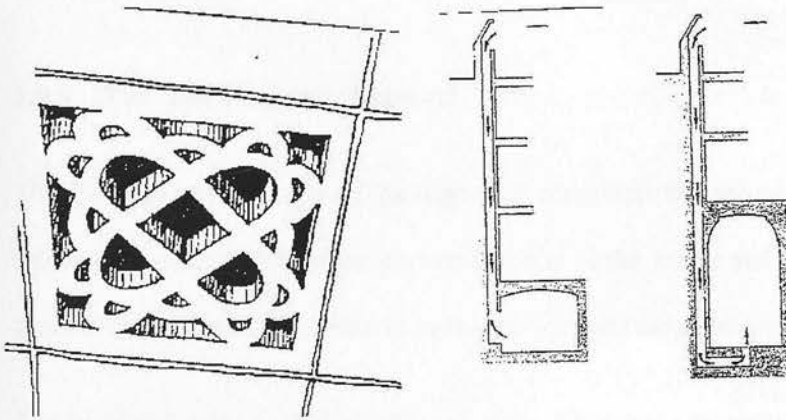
Badgeers: Roof scoops and outlets for the outside wall and floor and sections.
